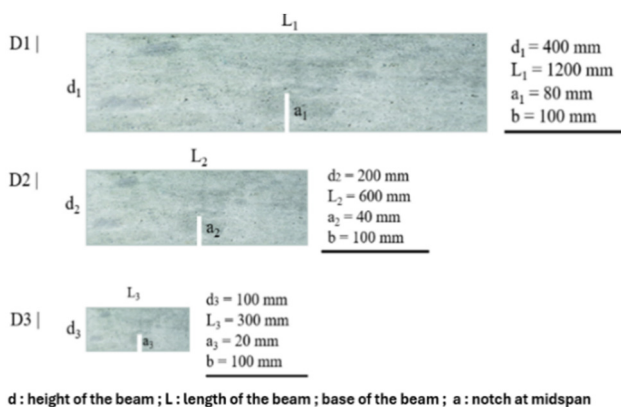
Designed geometrically similar concrete beam samples (notches).
